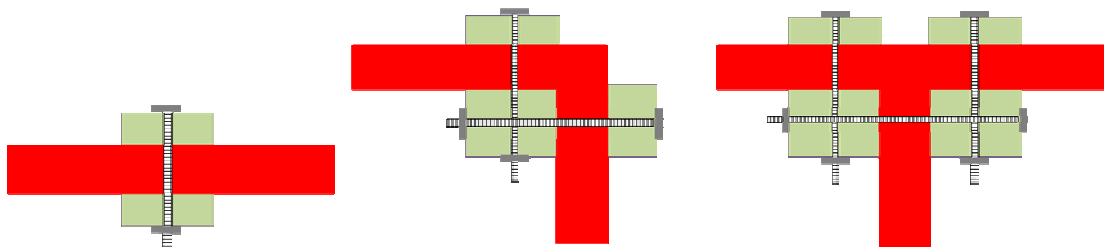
Timber framing added to existing brickwork, threaded rods @ 30 cm
